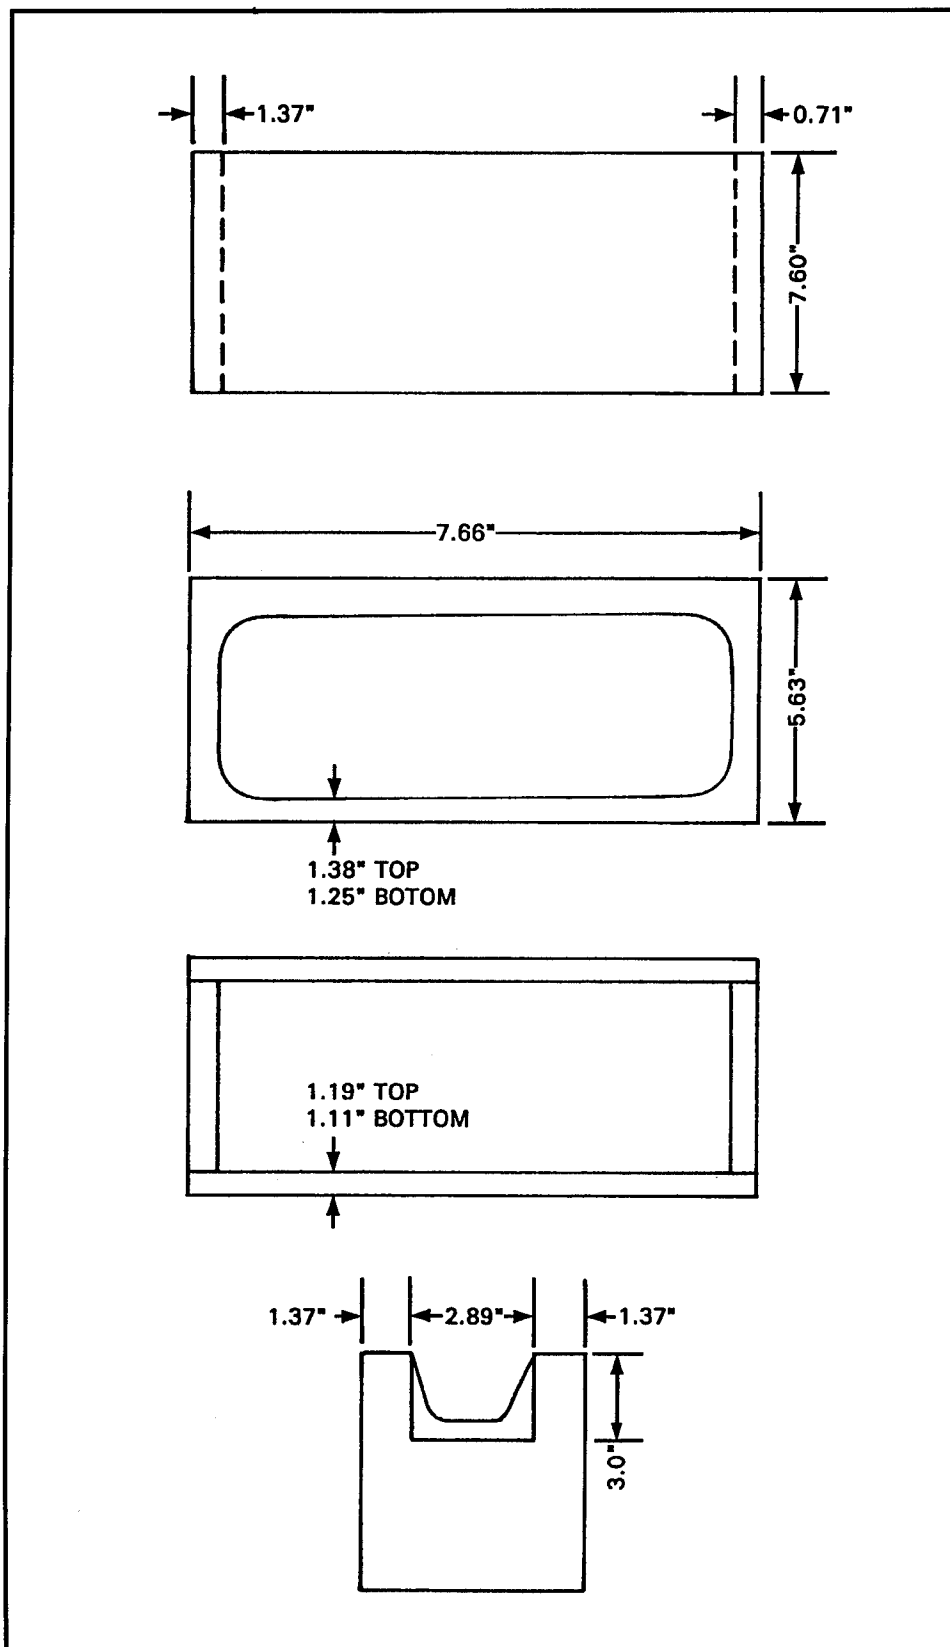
Typical elevation and cross section of 6-in. half-block concrete masonry unit
